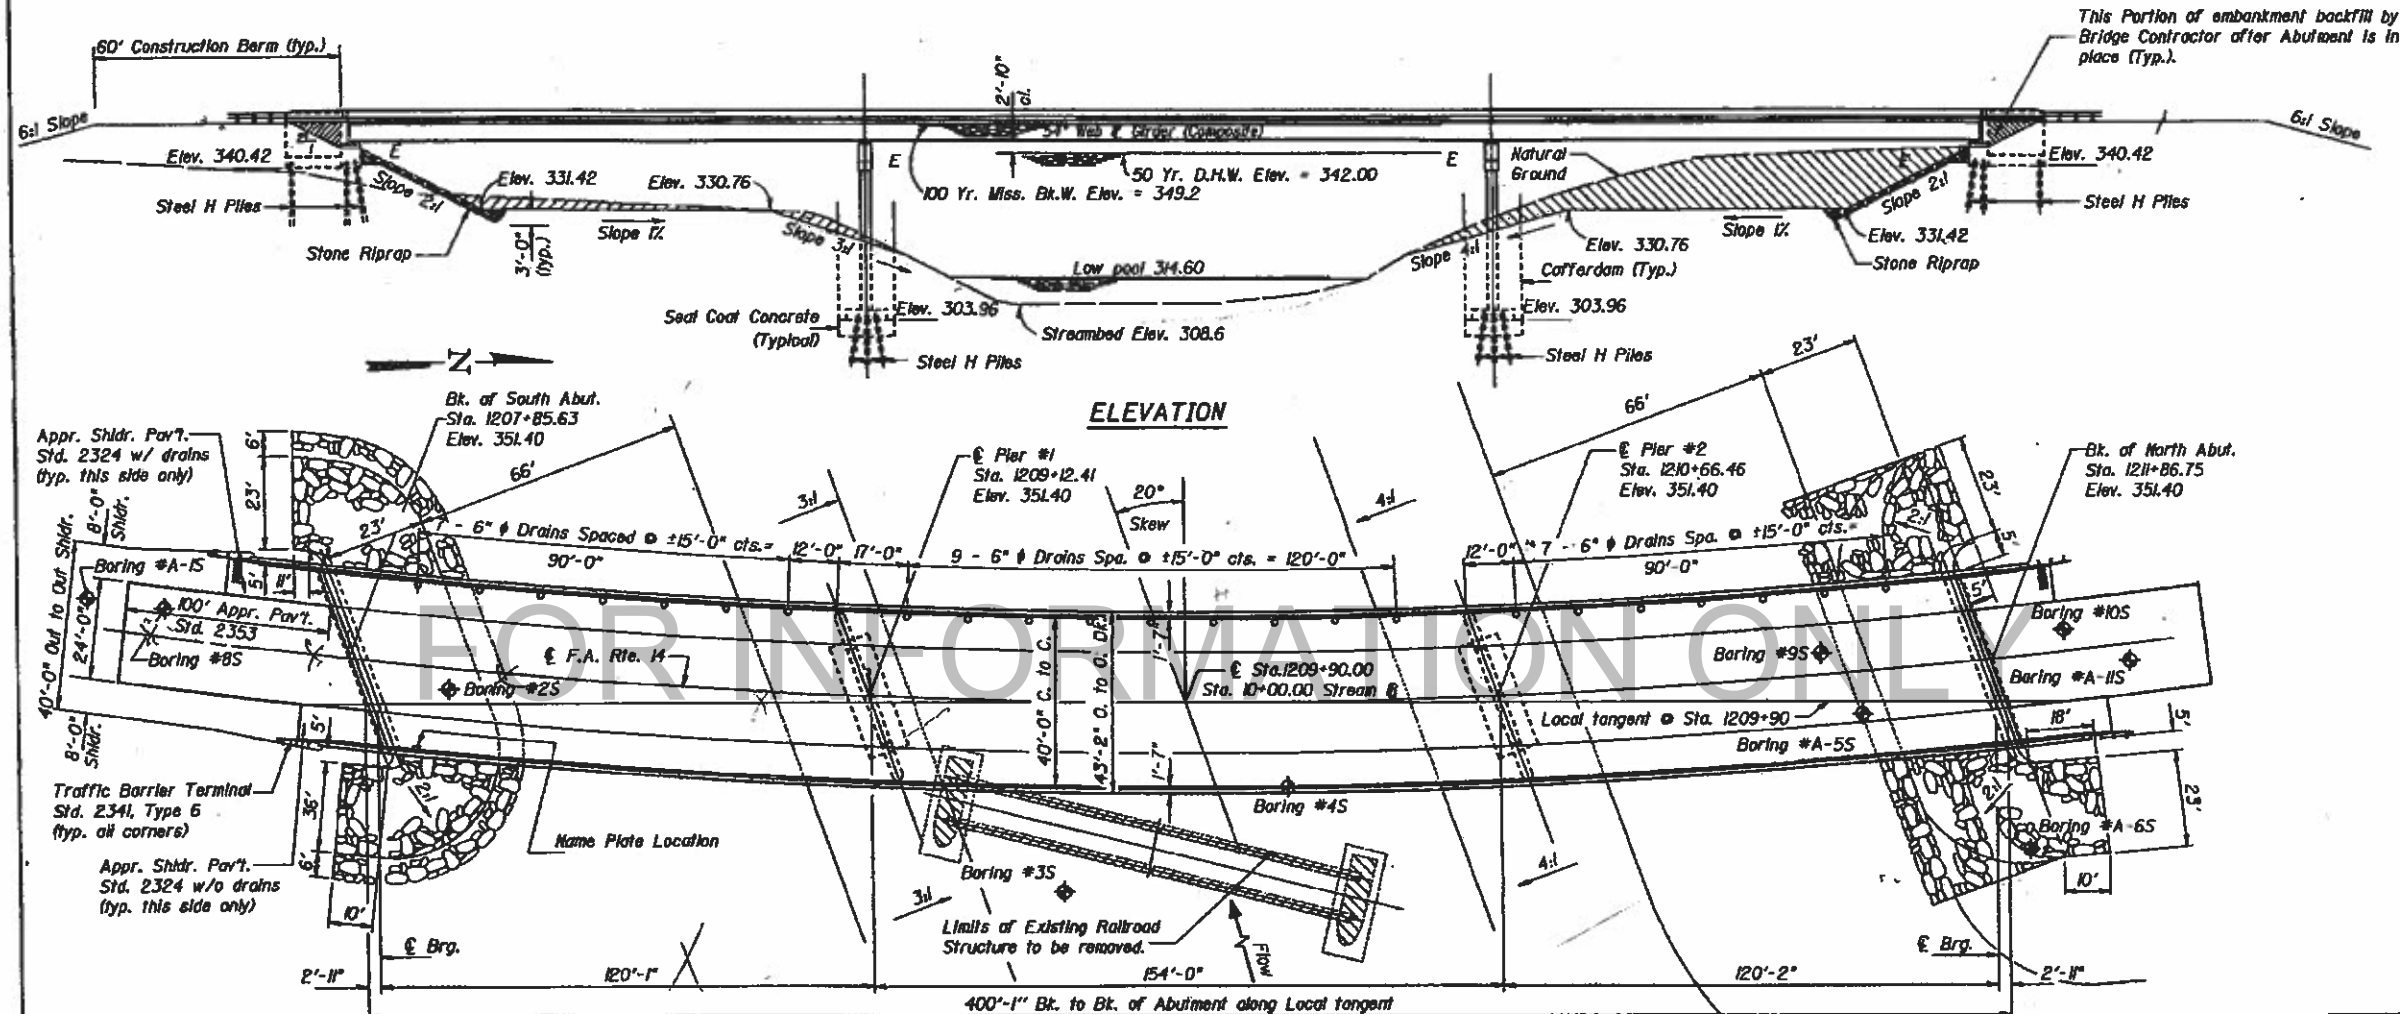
SINGLE PLAN AND PROFILE FULL LINE
